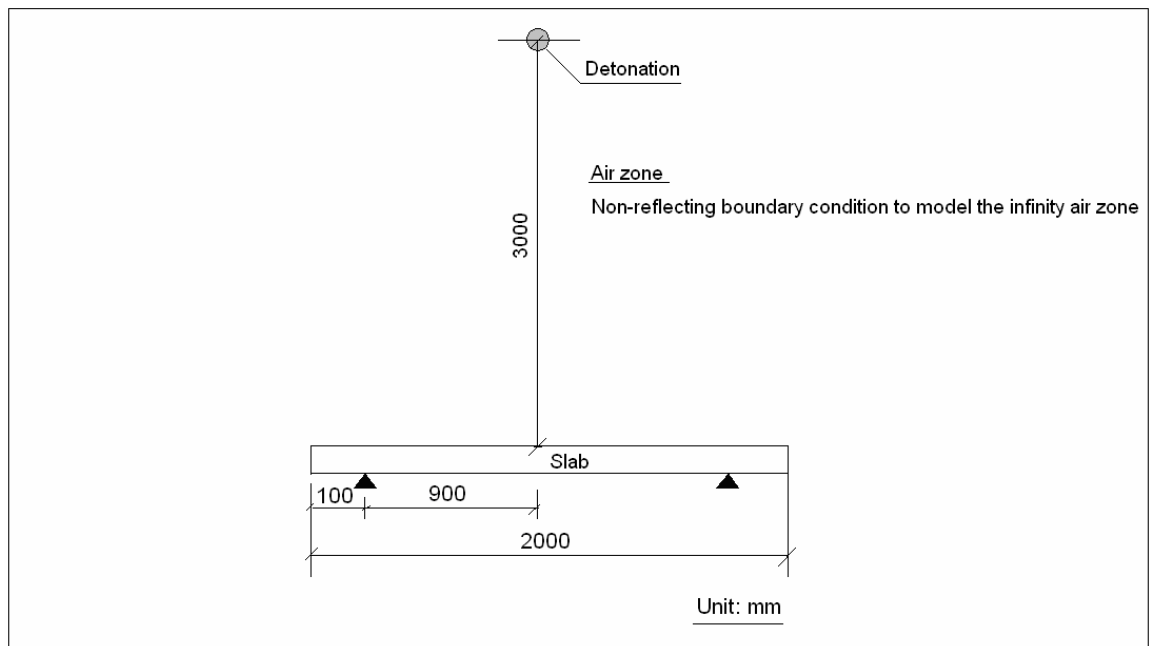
2D axial symmetric model sketch for concrete slab under blast load
